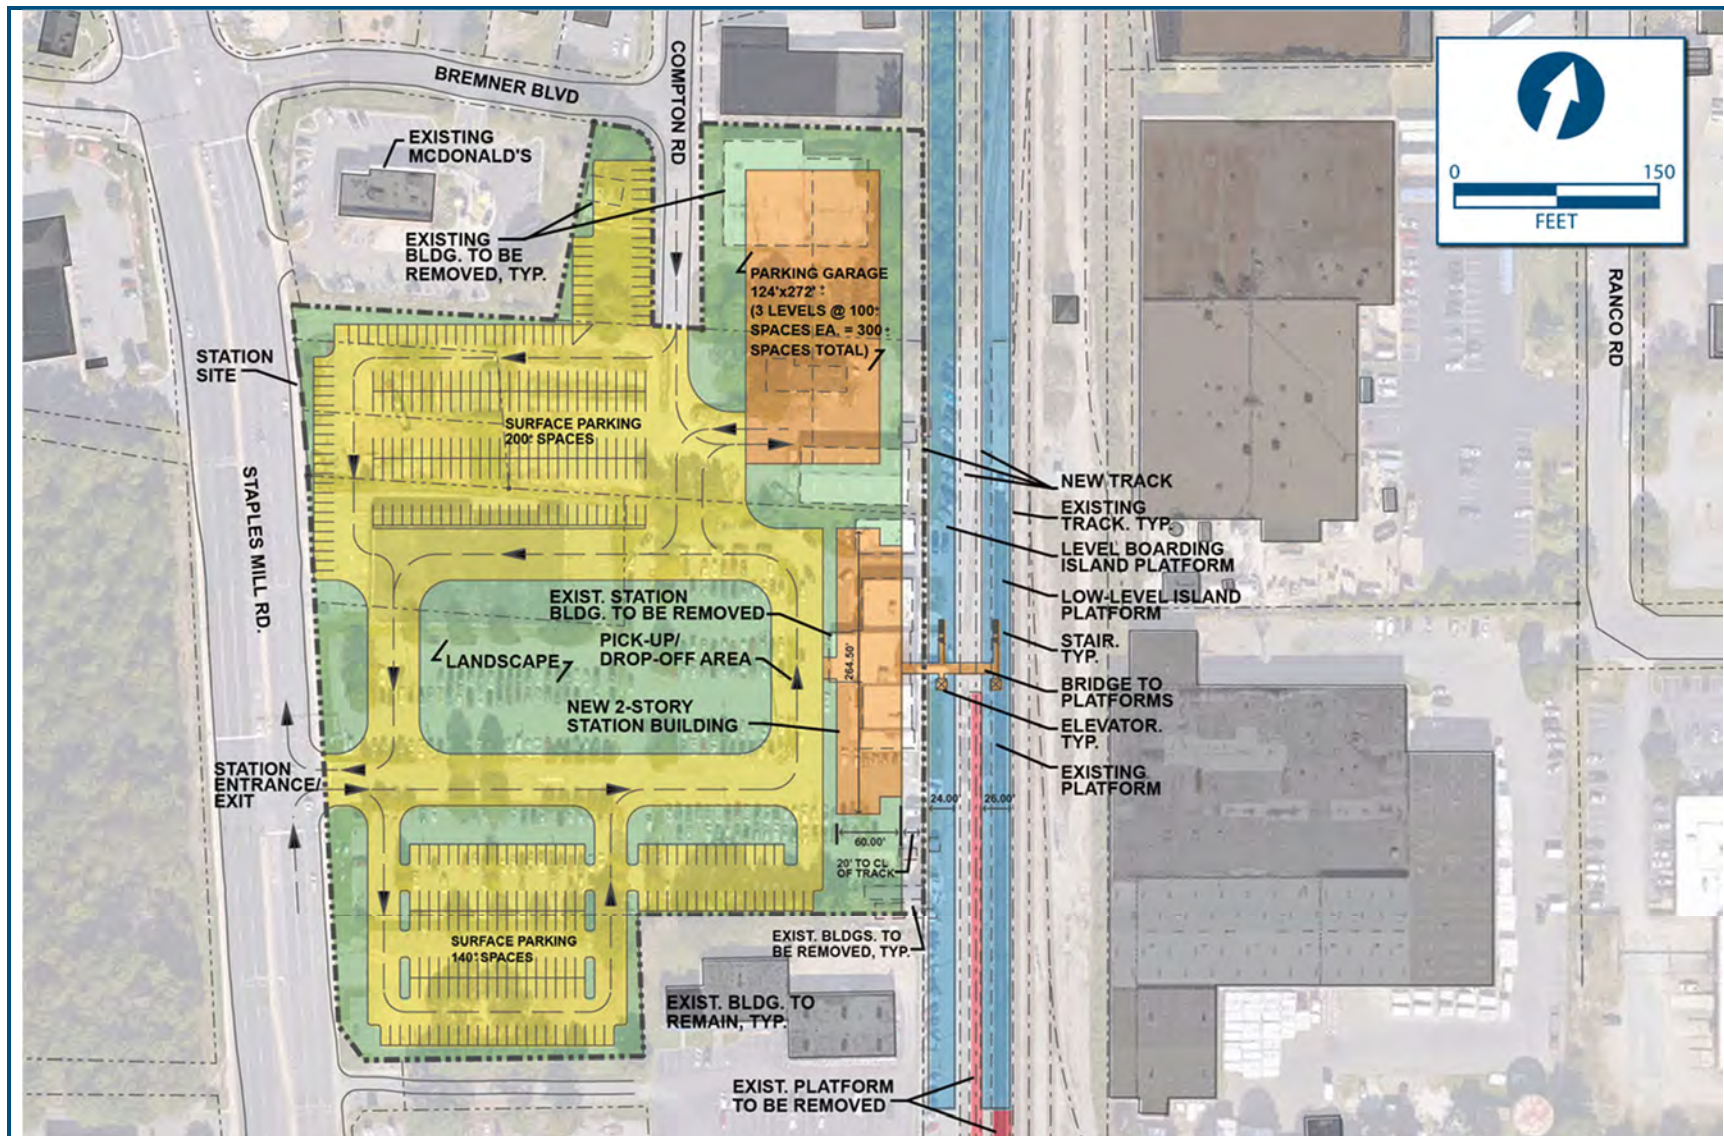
Staples Mill Road Station Improvements for Build Alternative 6A
